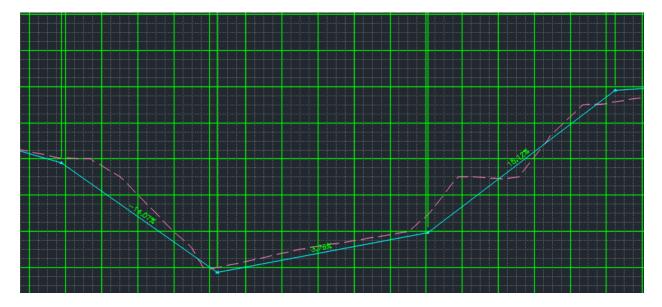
Street E.W.-1 – Vertical Profile at Proposed N.H.S. Crossing Location west of existing Simcoe Street North
